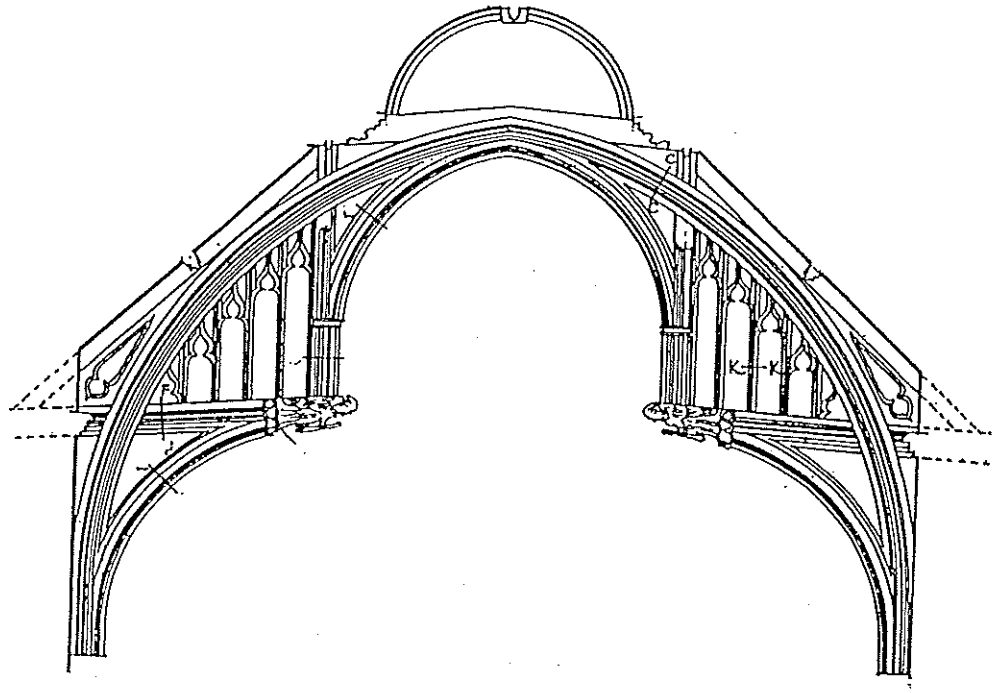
Example of a truss and a bay elevation from the Law Library roof
